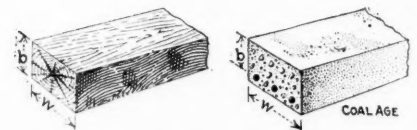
COMPARISON OF WOOD AND CONCRETE BEAMS
